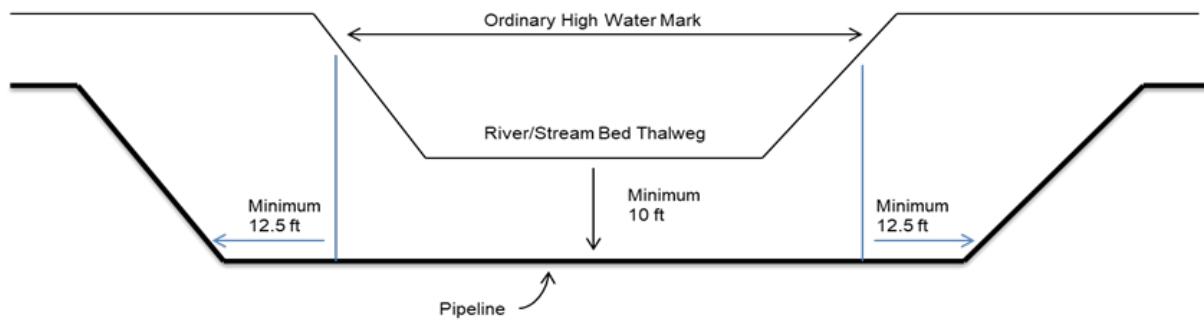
Figure D. Typical schematic for Navigable Rivers and Streams without channels demonstrating pipeline placement requirements.
